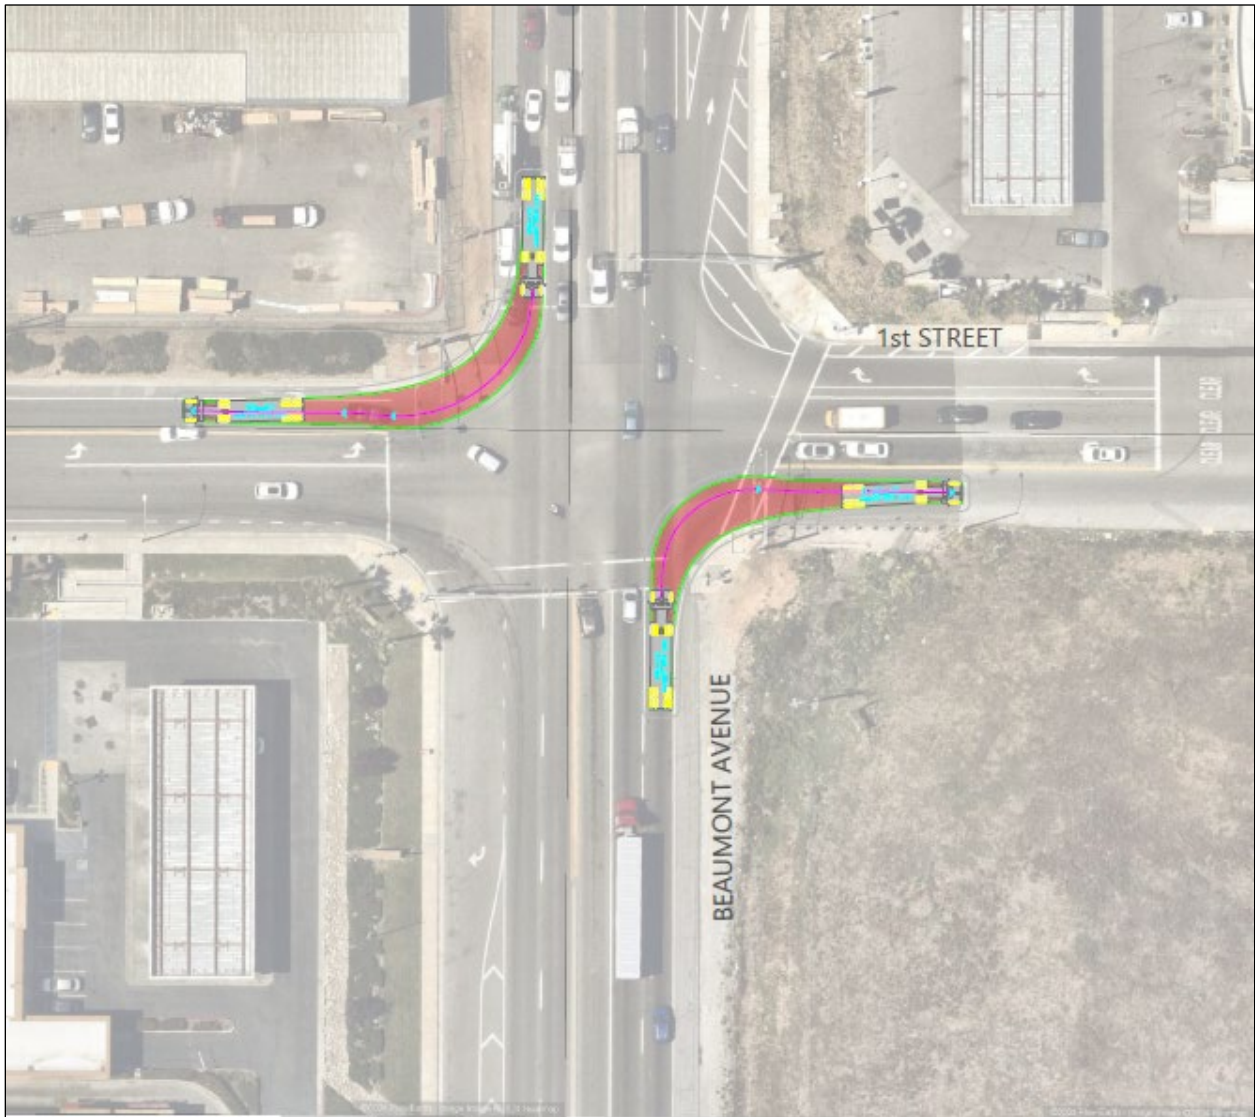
WB-67 Truck Turning Movements - 1st Street and Beaumont Avenue
